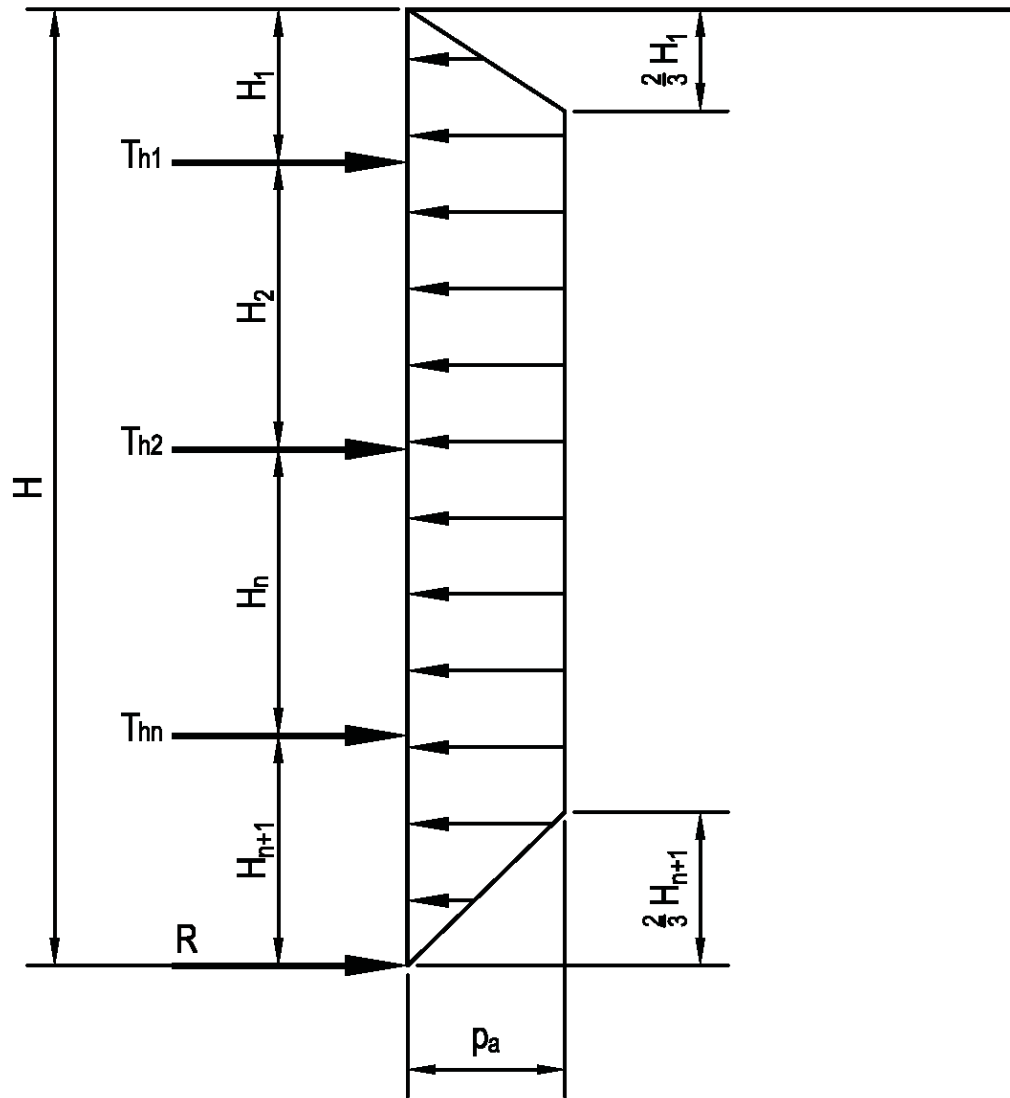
Apparent Earth Pressure Distribution for Multi-Anchored Walls Constructed from Top Down in Cohesionless Soil under Static Condition (after AASHTO, 2007)
